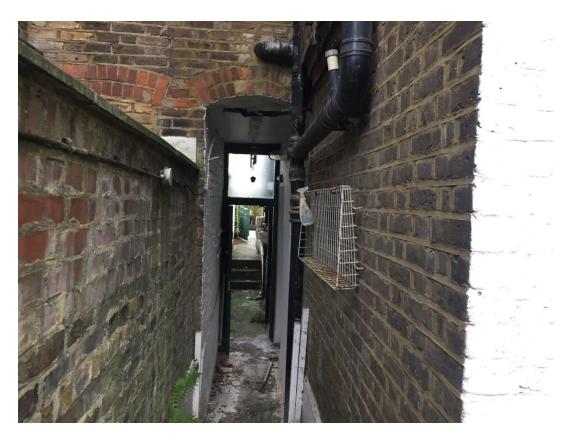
View of side passage and undercroft below first floor which is to be enclosed
